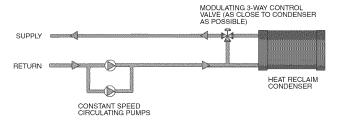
B — Three-Way Head Pressure Control Valve Location (Alternate)
